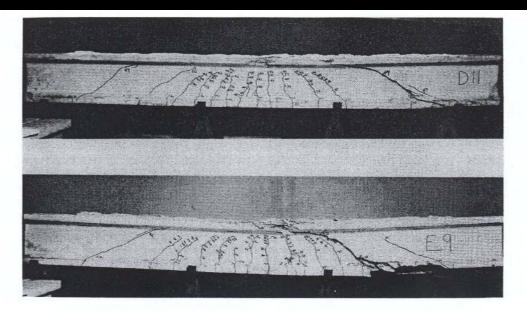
Typical shear failure in prestressed beams without web reinforcement. (Courtesy Prestressed Concrete Institute.)
